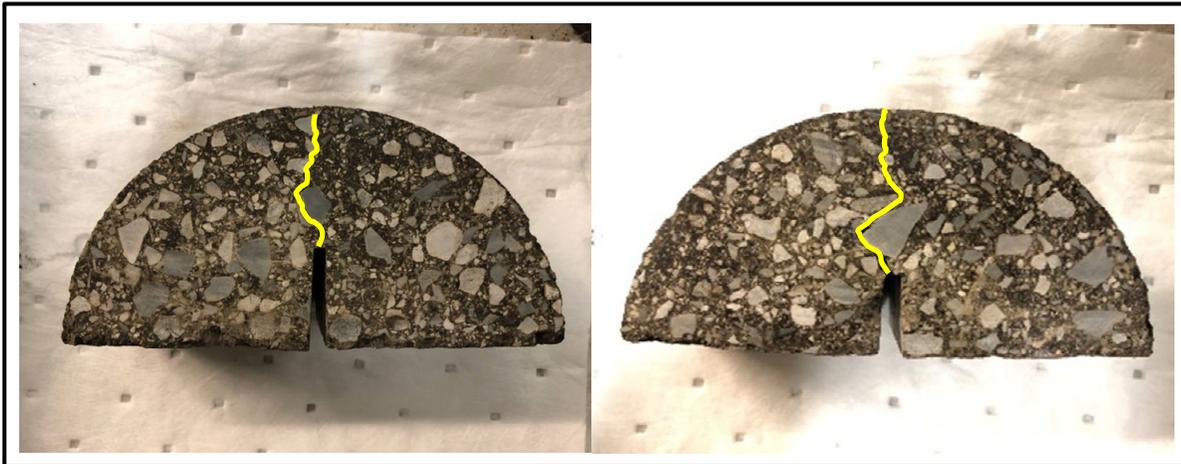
5 Examples of crack propagation in SCB specimens (the yellow line highlights the crack position)
